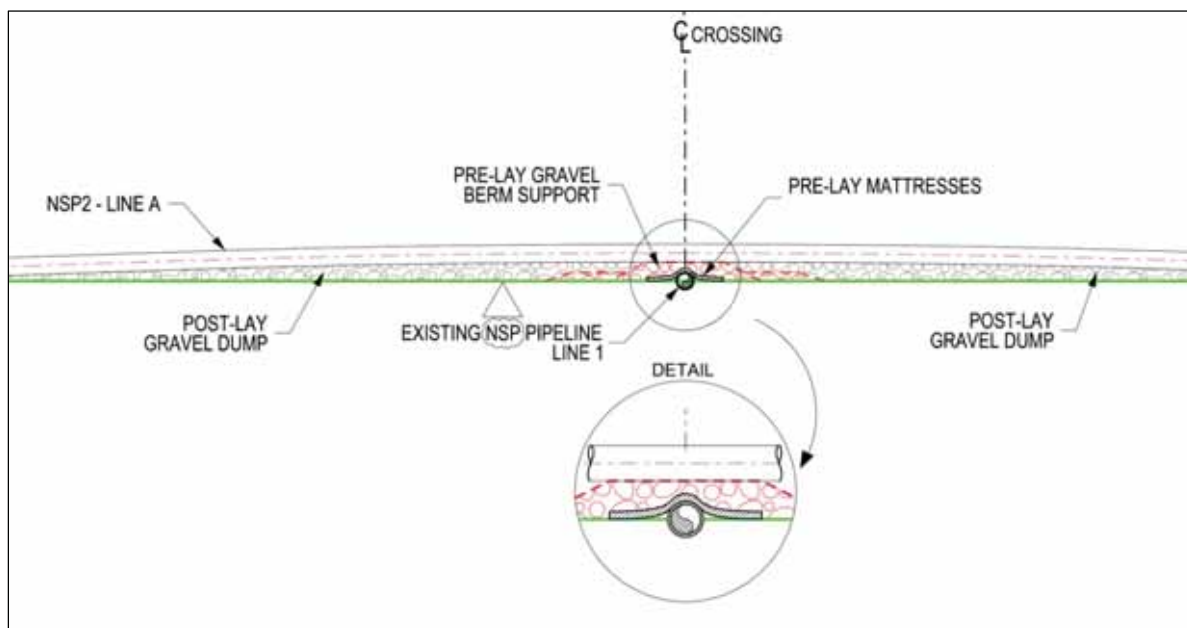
Typical pipeline crossing (preliminary drawing).
